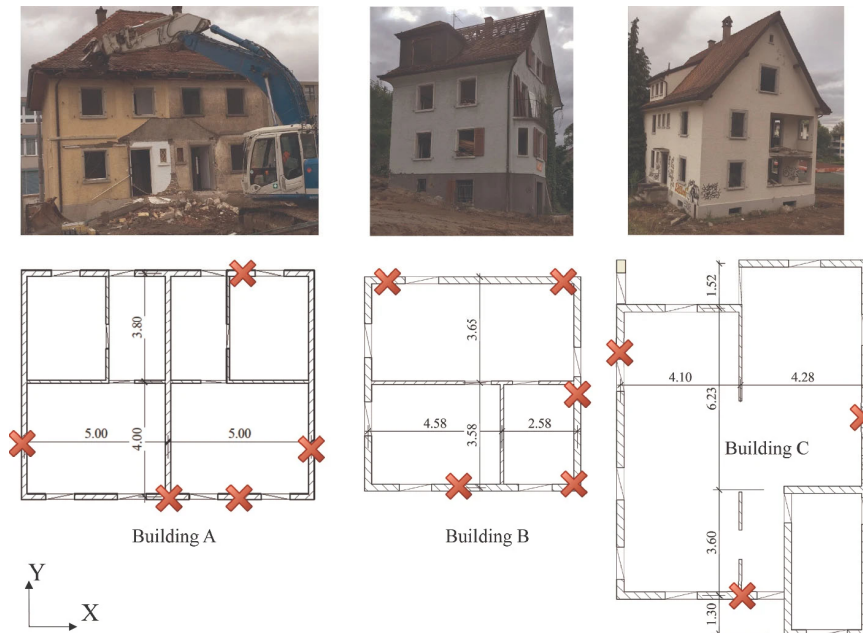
Photos of the three buildings taken prior to the demolition (top) and floor plans of the three studied URM buildings with sensor positions are marked with red crosses (bottom). Additional details of the measurements can be found in RISE milestone 37.
